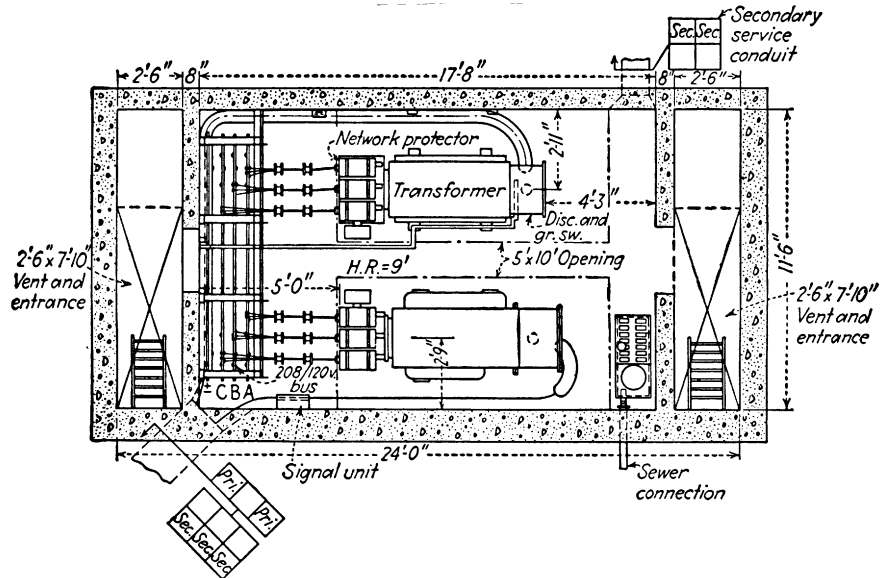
General arrangement of a network vault under a sidewalk (plan view).
